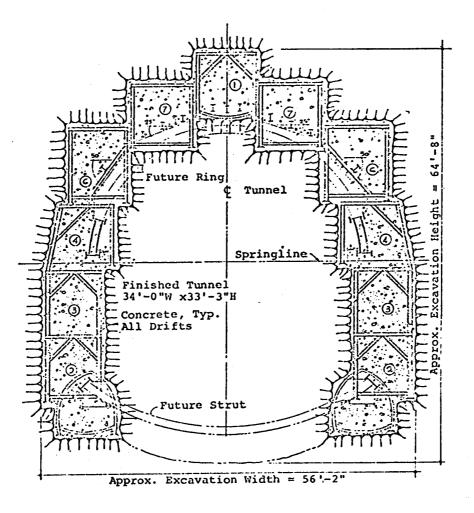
Zone II – Multiple Drifts Sta. 82+40 to 84+00.
